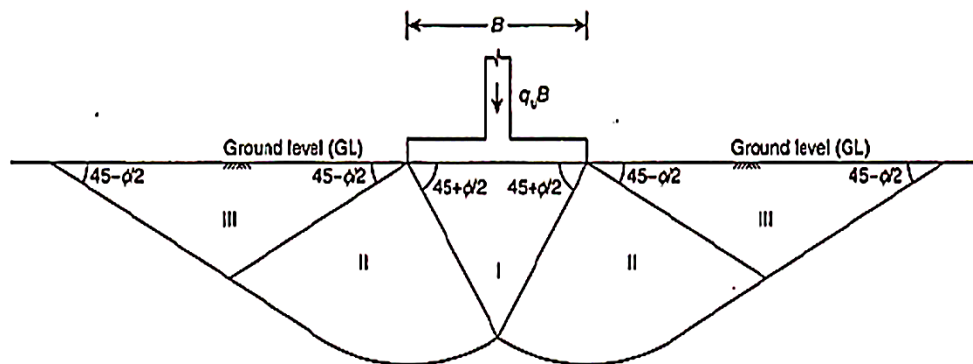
Failure plane of a shallow footing (Prandtl, 1920).
